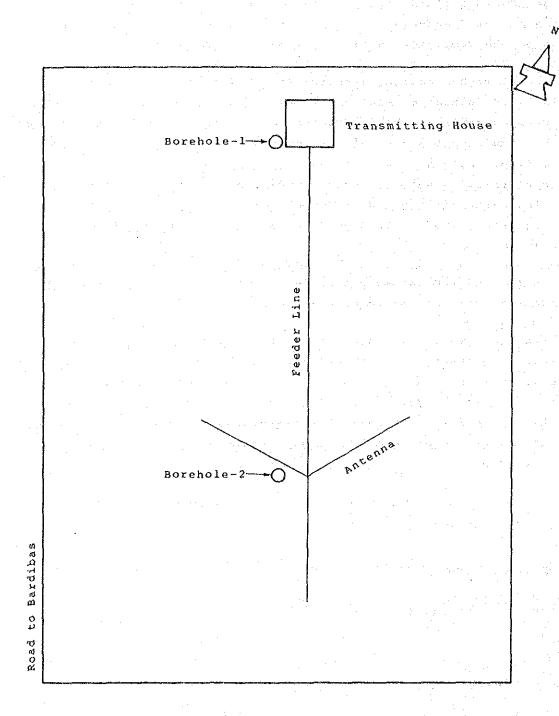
Site Plan of Dhalkebar medium wave transmission tower station (Scale: 1/1,250)
